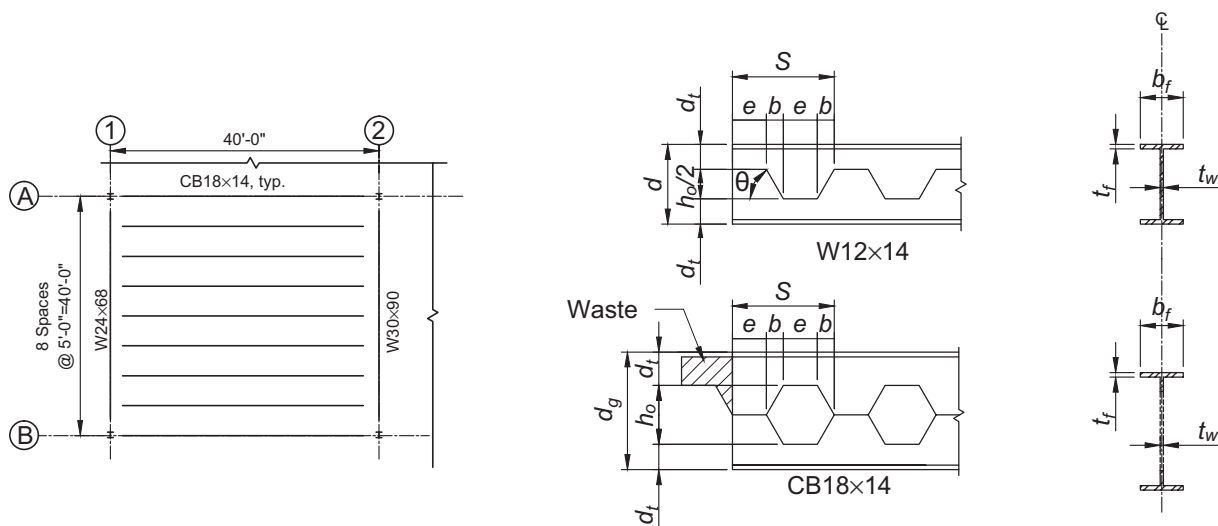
Structural framing layout and castellated beam nomenclature for Example 4.1.
